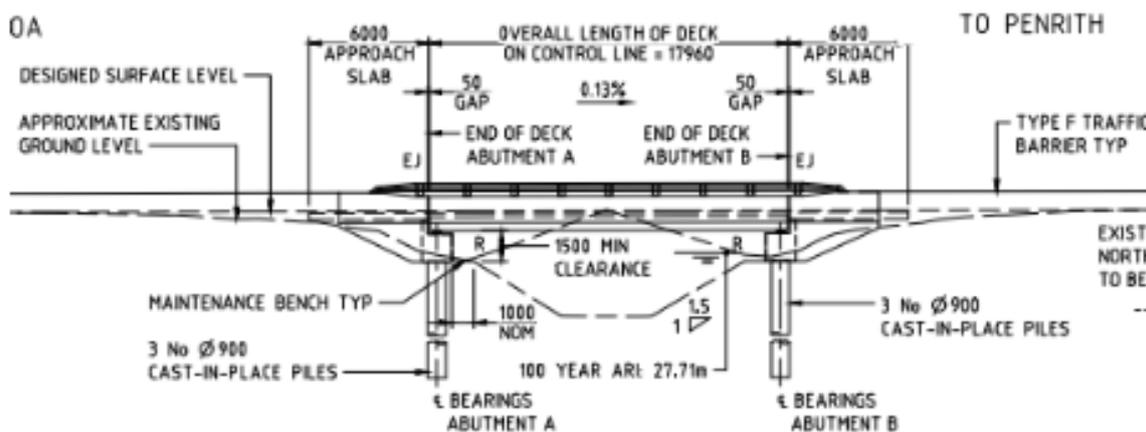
Proposed Surveyors Creek bridge elevation view
